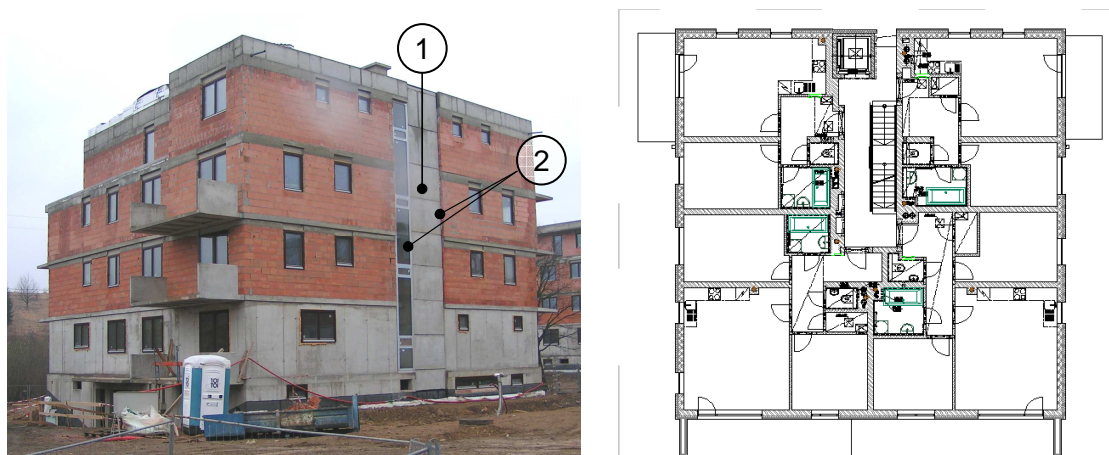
The studied building. Left hand side: initial state, 1 - elevator shaft, 2 – expansion joint. Right hand side: typical residential floor plan
